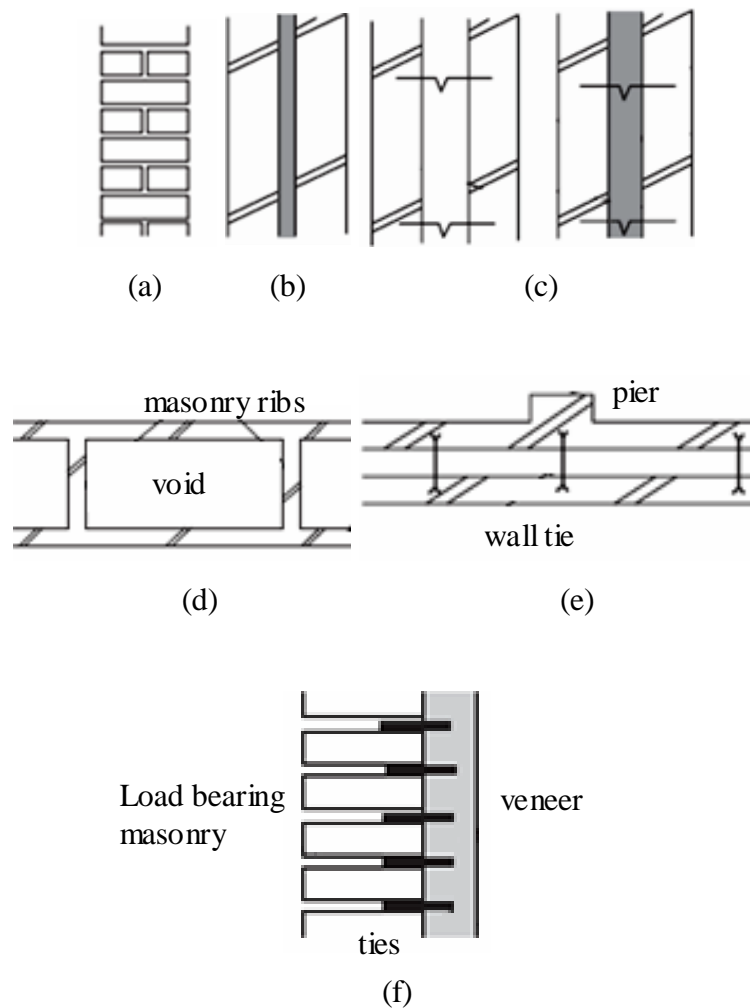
Types of Masonry Walls in terms of their cross section (European Committee for Standardization, 1999, Curtin et al., 2006); (a) Single-Leaf Wall, (b) Double- Leaf Wall, (c) Cavity Wall, (d) Diaphragm Wall, (e) Piered Wall (f) Veneered Wall
